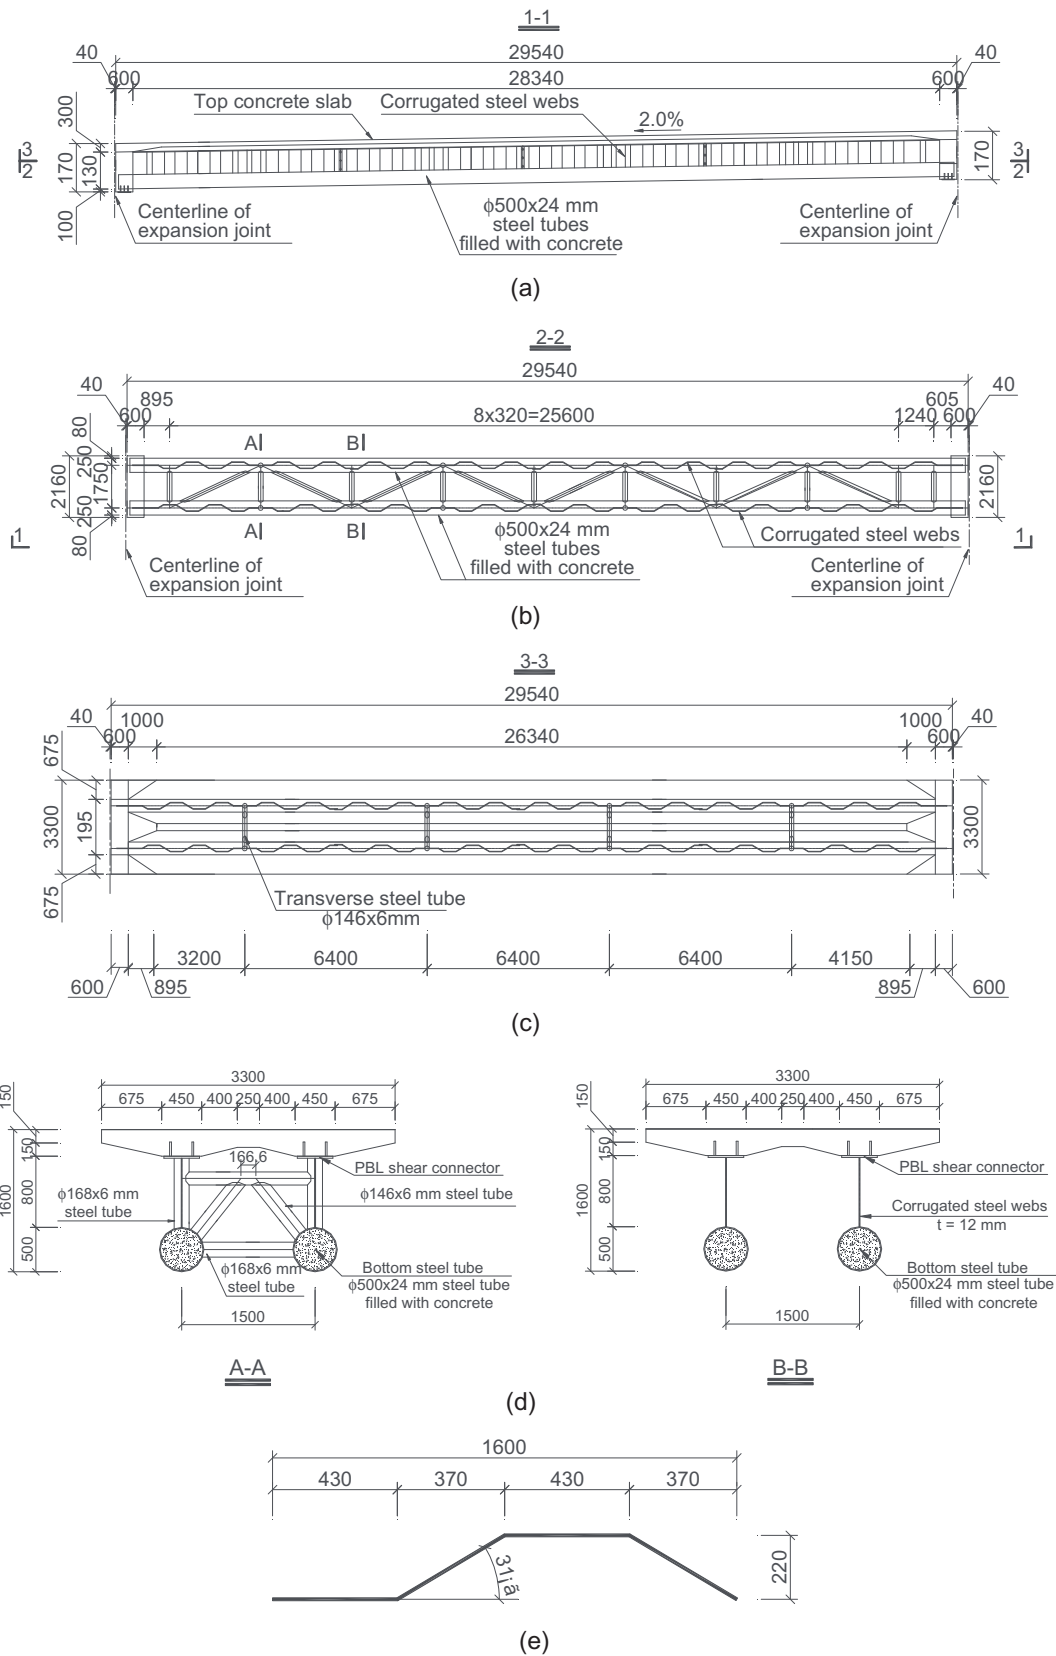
Design of the footbridge (Unit: mm): (a) side view (Section 1-1); (b) Section 2-2; (c) Section 3-3; (d) typical cross-sections; (e) a corrugation of webs.
